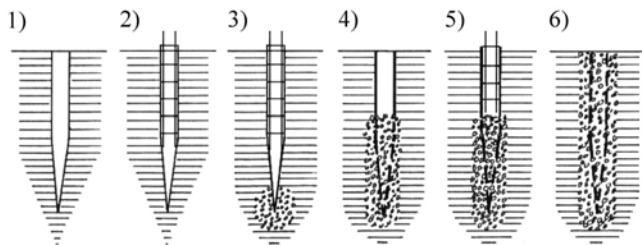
PUH versions per filling material: 1 - concrete, 2 - reinforced concrete, 3 - reinforced concrete strengthened with crushed stone in the face; 4,5 - combined; 6 - ground (crushed stone, ground and crushed stone, clay, sand, slag).
